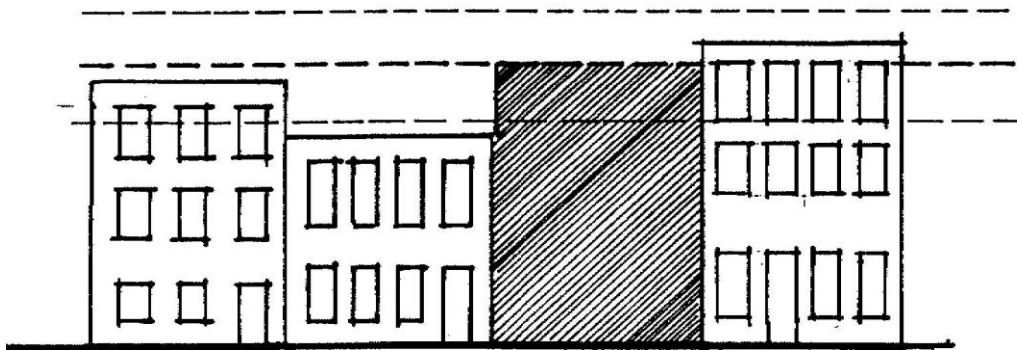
Schematic elevation sketch of a mixed-use streetscape. To create a visually unified streetwall, buildings should be no more than 30% taller nor 30% shorter than the average building height on the block.
